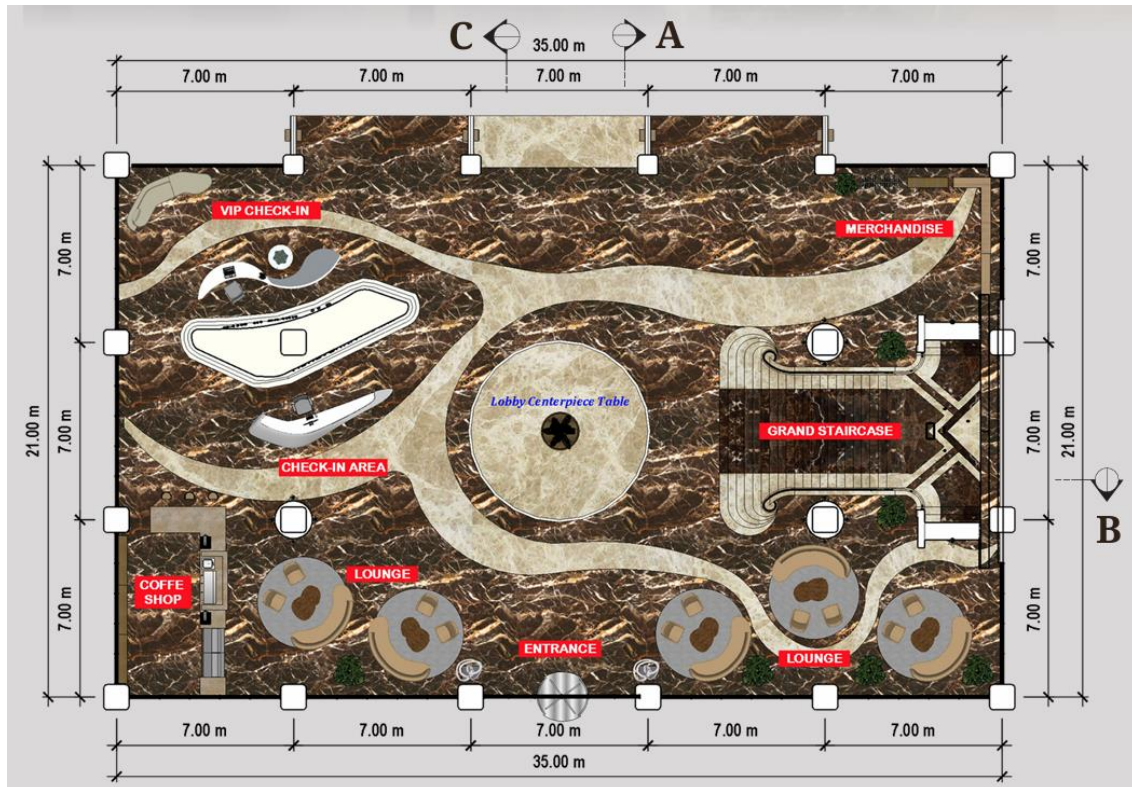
hotel lobby interior design floor plan (35 m x 21 m)
